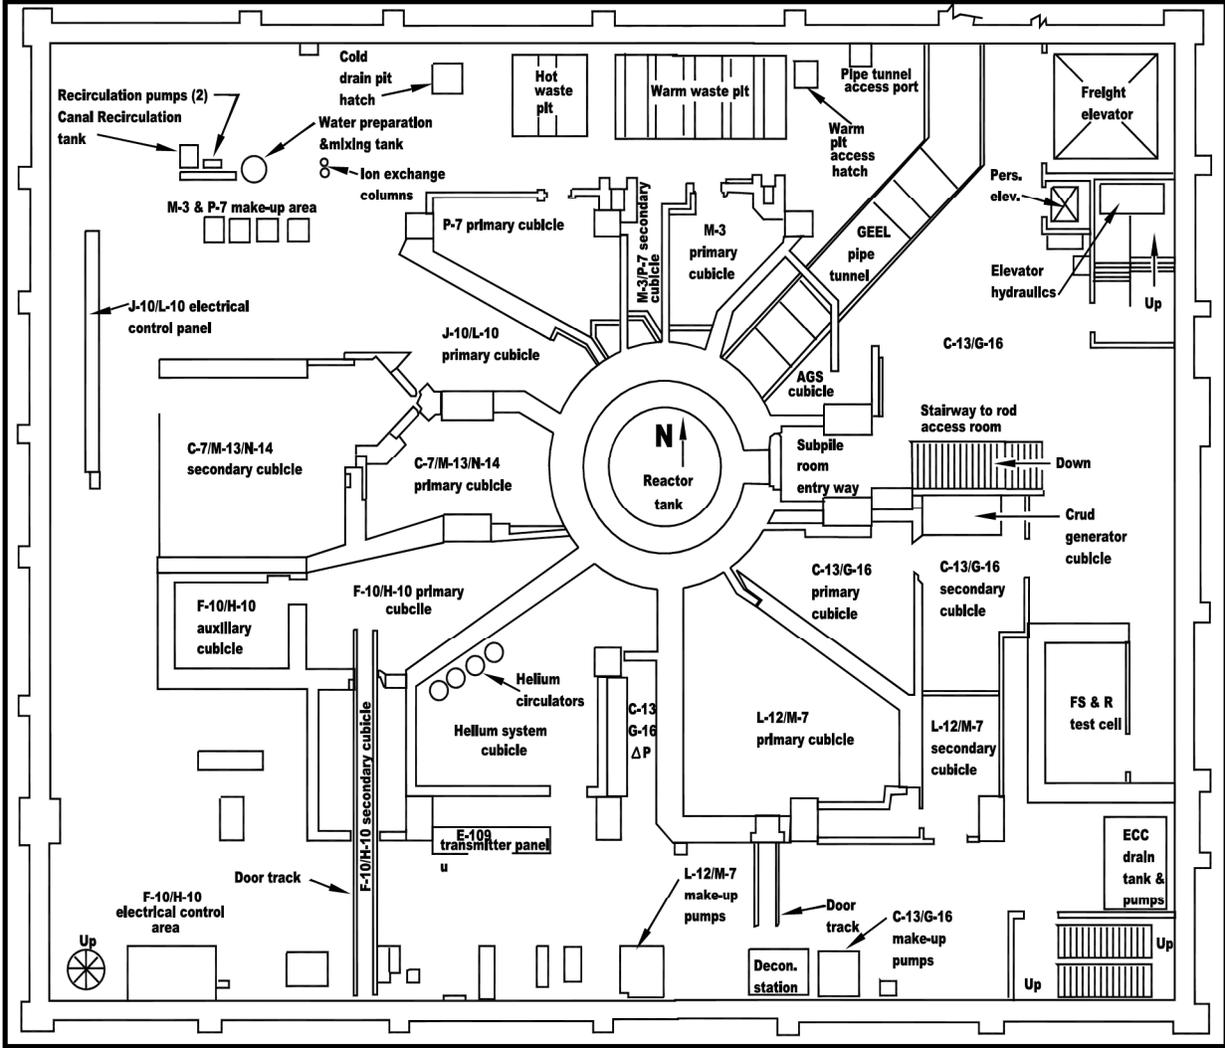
Basement floor plan of the Engineering Test Reactor building (TRA-642) showing the experiment cubicles.
